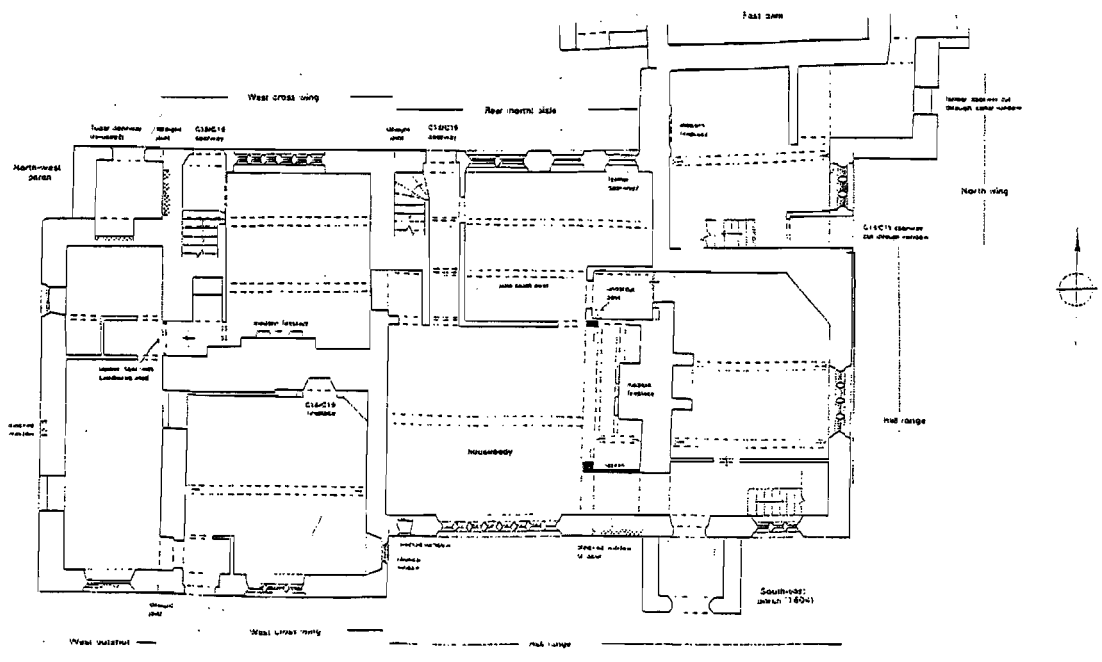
Ground-floor plan of the Upper Headley farmhouse showing the arrangement and nomenclature of the separate sections of the building (figure supplied by Ed Dennison Archaeological Services)
